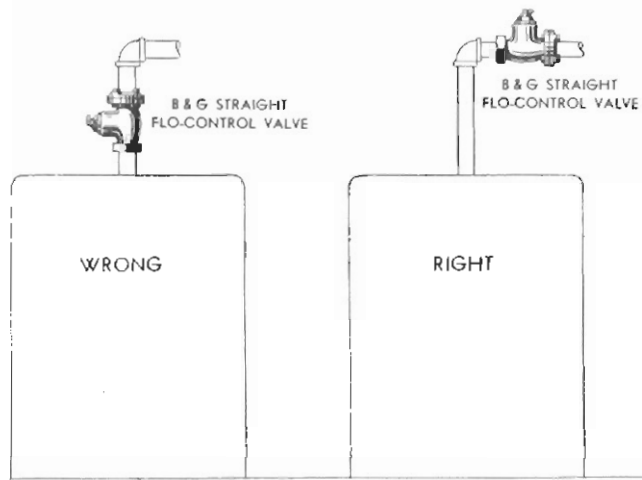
The B & G Straight Flo-Control Valve should always be installed in a horizontal position.
